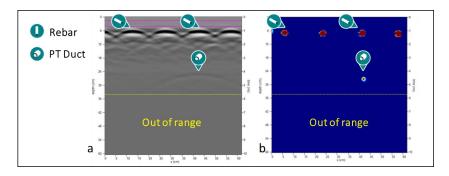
Hilti PS-1000 fails to reach the back wall and its rebar mesh, and to detect the void
